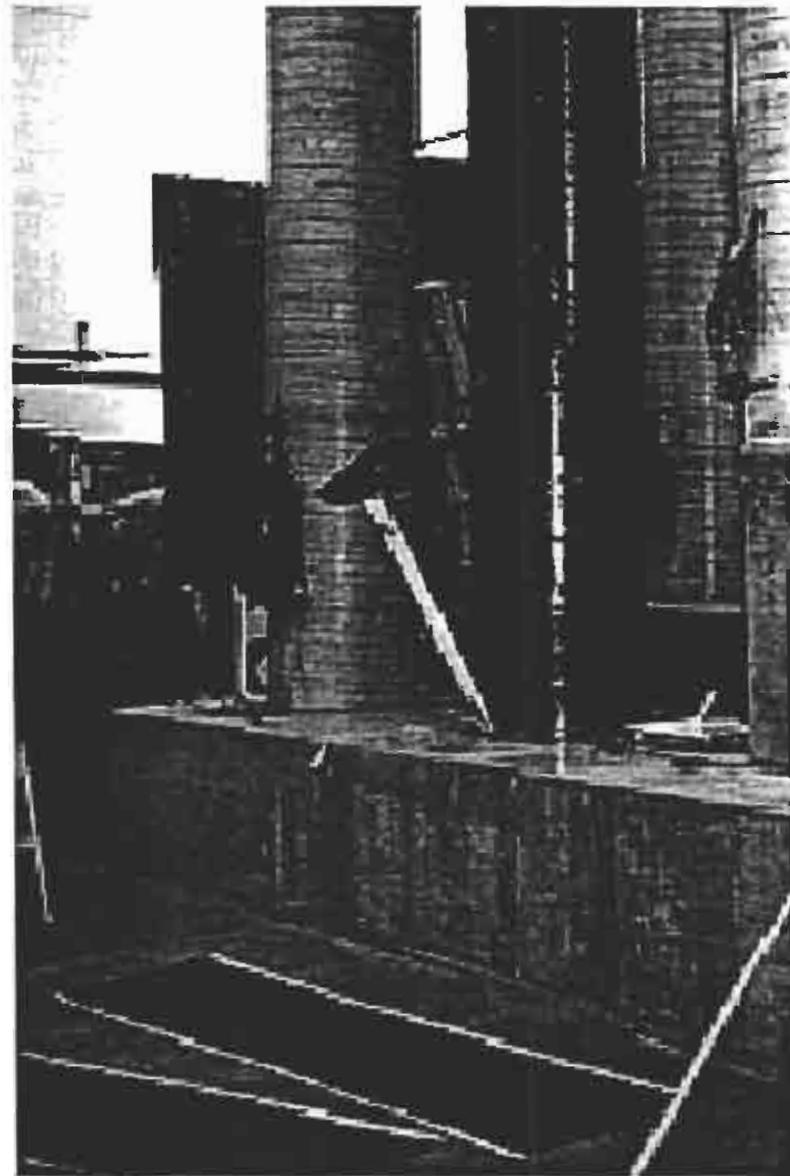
Jacket Application for Lap Splice Enhancement Circular Column CF-5
